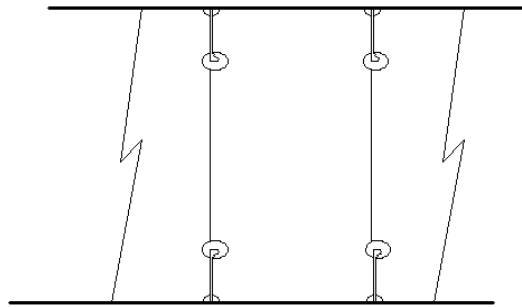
Block assembly methods 2c and 4-1e
